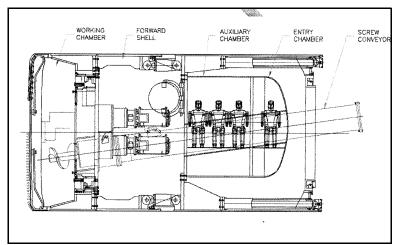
Drawing of the "machine room" of the Brightwater West Tunnel Boring Machine. Cutting face is on the left side. The machine room itself is at working pressure.
